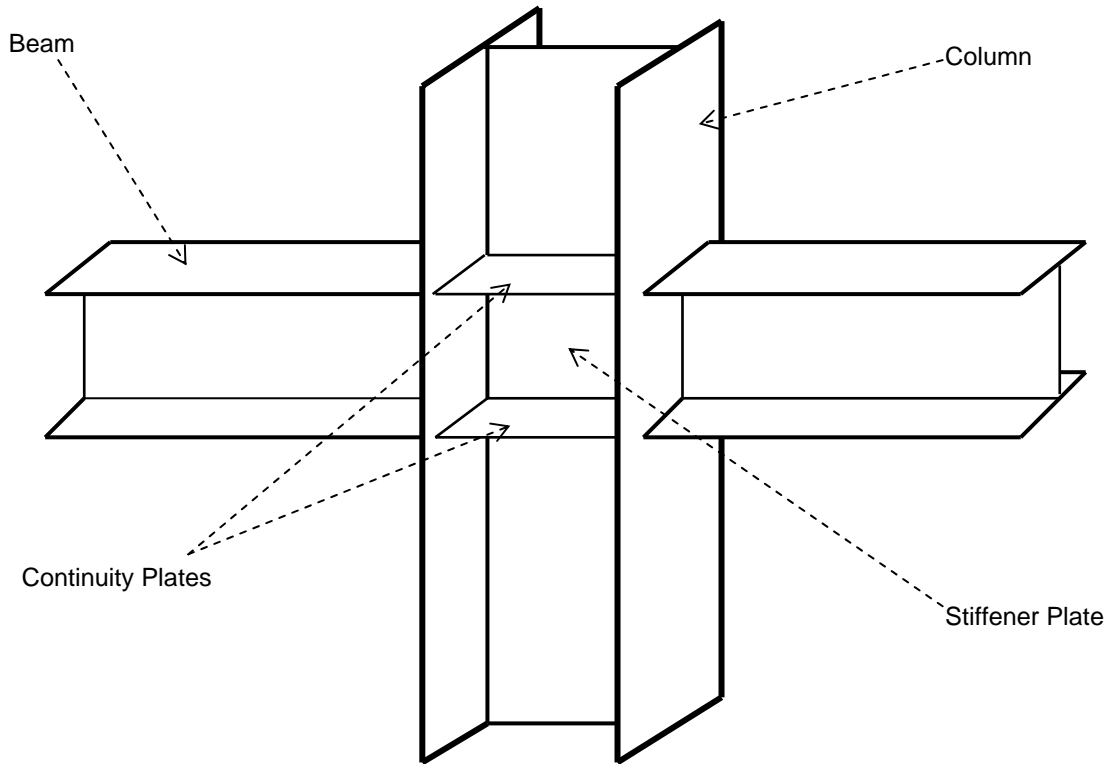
Typical beam-column joint in steel moment resisting frames
